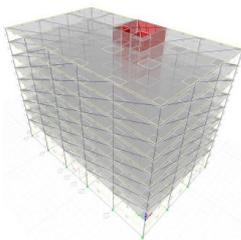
Model 4: 3D view of flat slab structure with shear wall at lift portion
